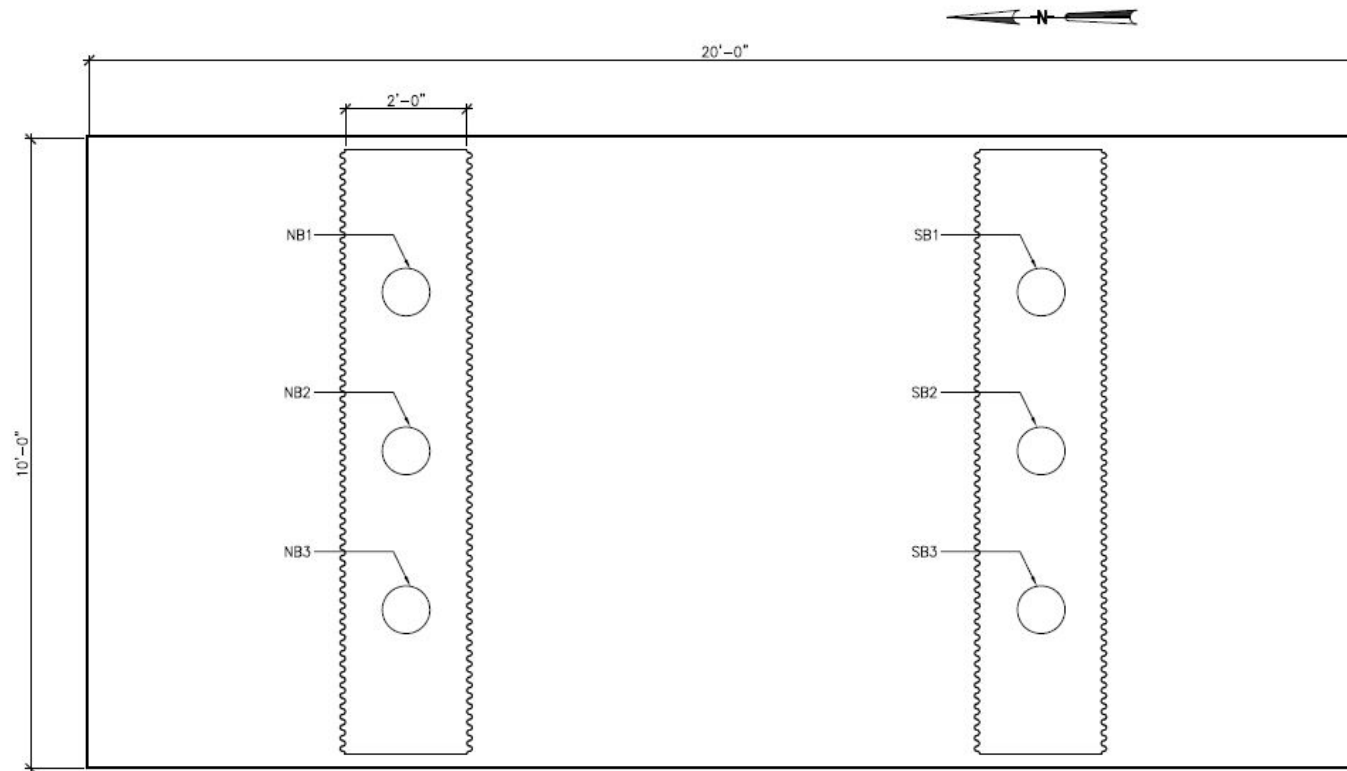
Earth pressure cell layout through Section E-E for 24 inch HDPE pipe test
